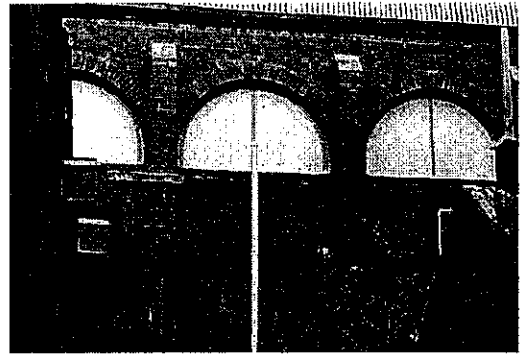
Exterior, Exchange Hall and Toilet Wing (part north & west elevations respectively). Note the deteriorated rendered capping to the parapet of the lower north façade of the Exchange hall.
